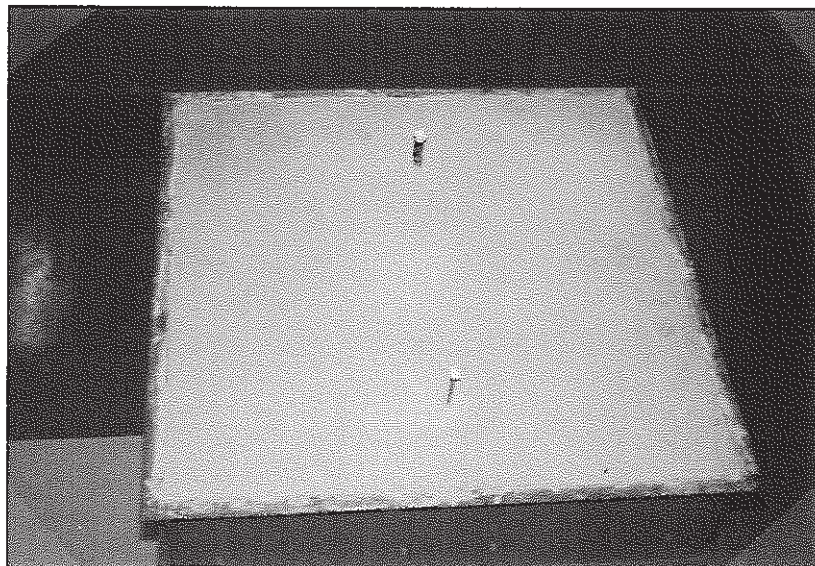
Examination of Structural Concrete after Pouring in Model A.
